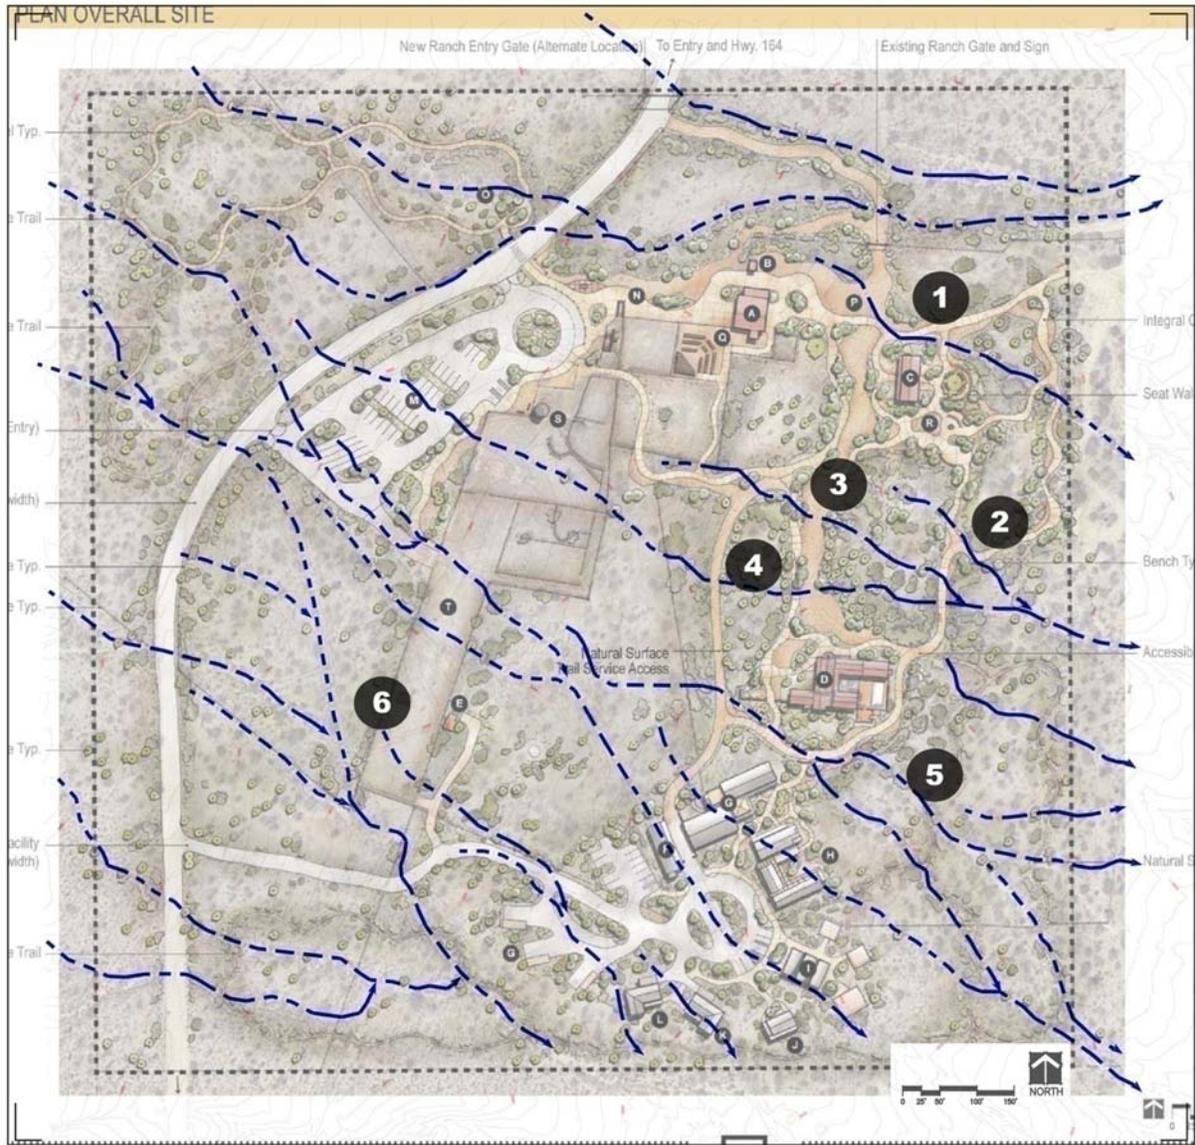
Walking Box Site Hydrology - Existing Drainage Pattern Across Site.
